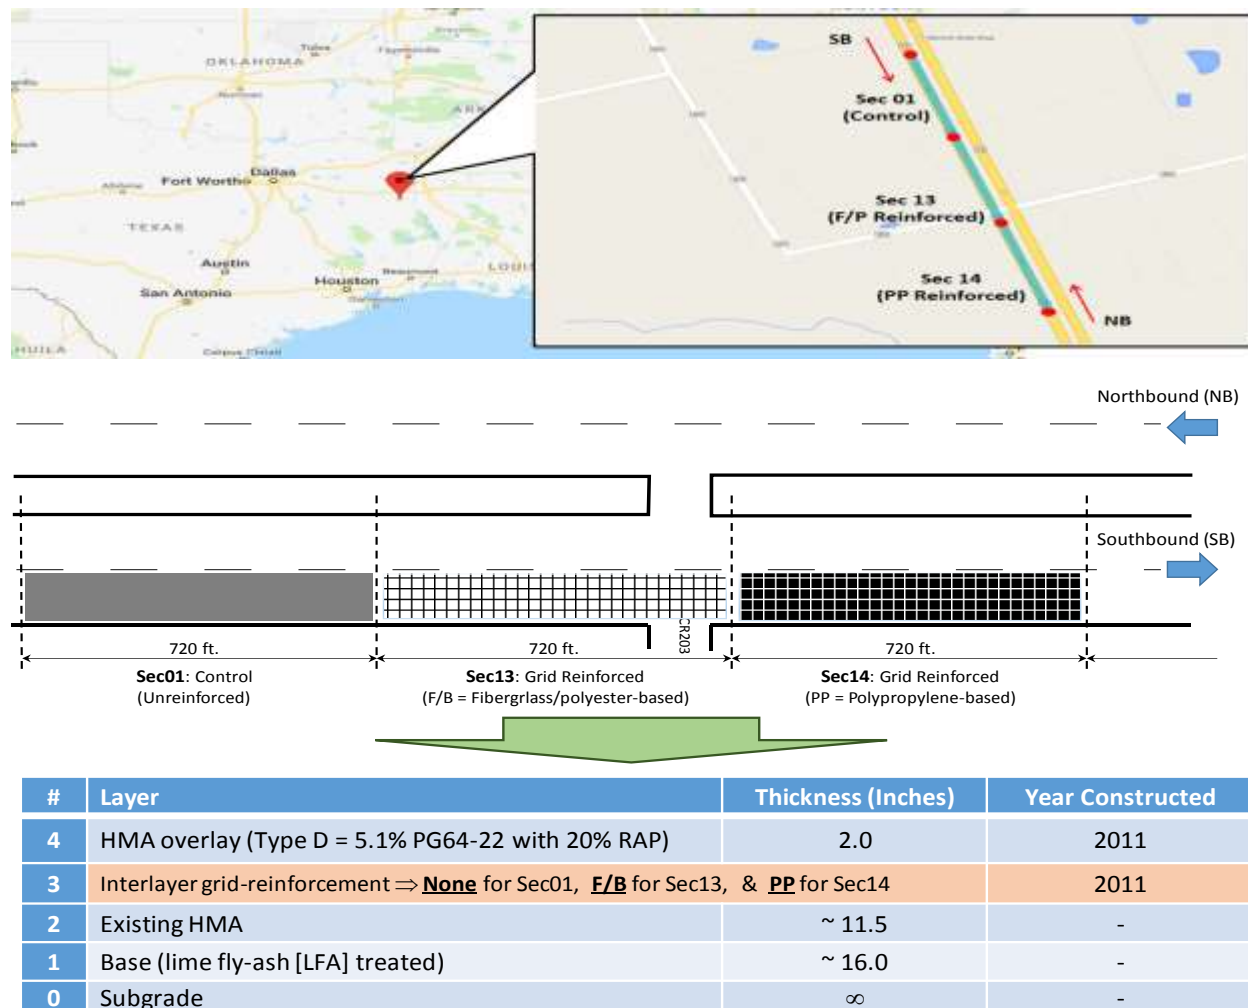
US 59 Test Section Location, Plan View, and Pavement Structure.
